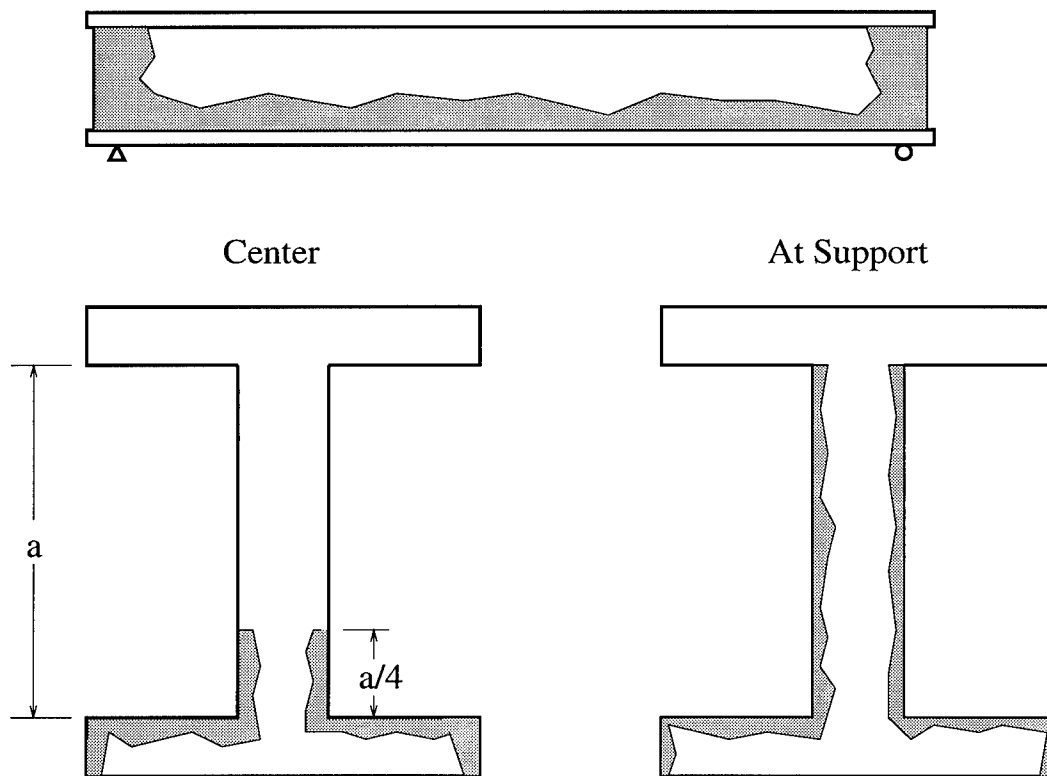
Corrosion Pattern on Steel Girders on Bridge E-17-AH
